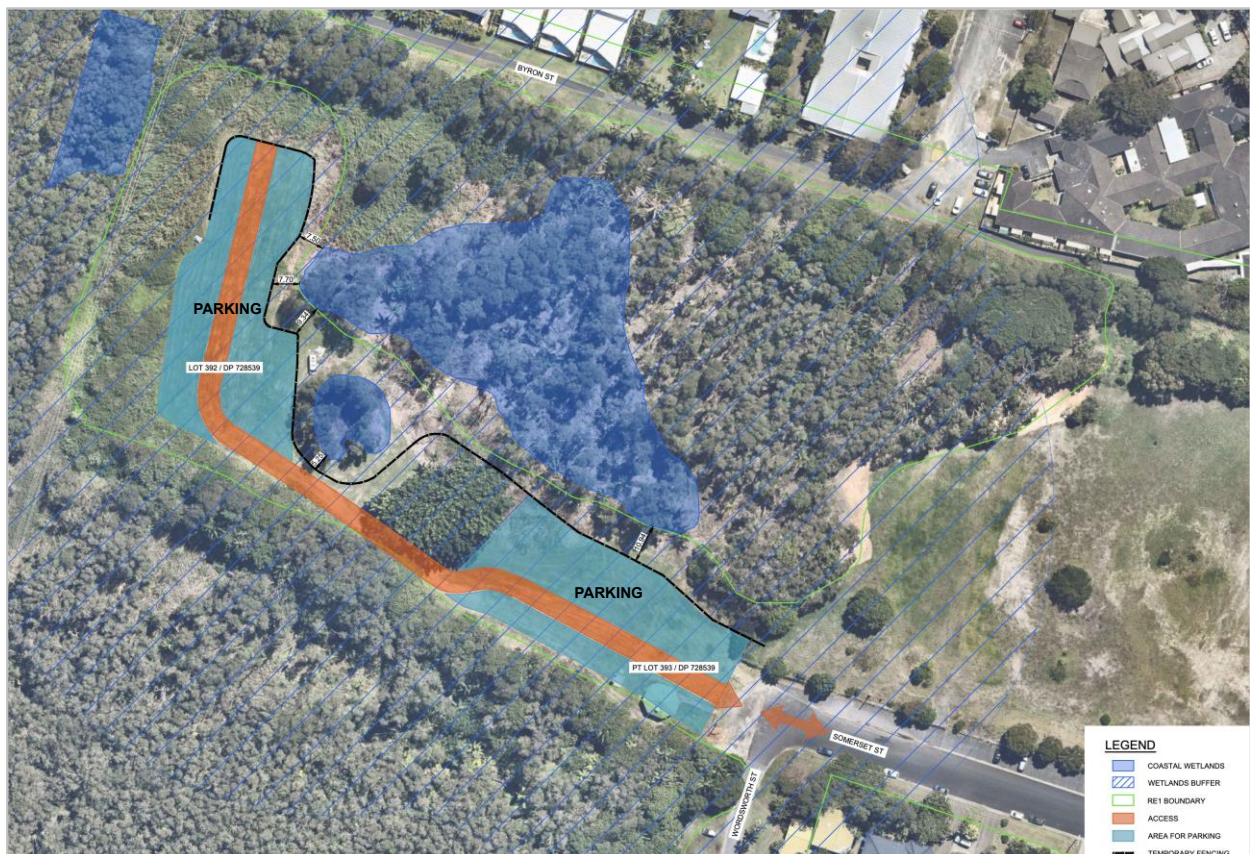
Car Parking Plan (source: *Planit Consulting*)
